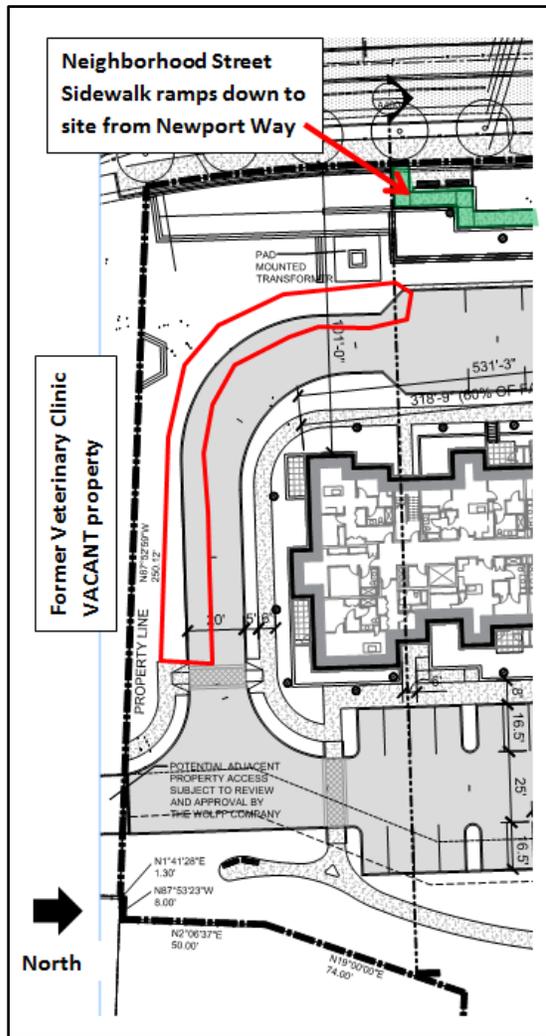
North Section of Neighborhood Street showing missing sidewalk
